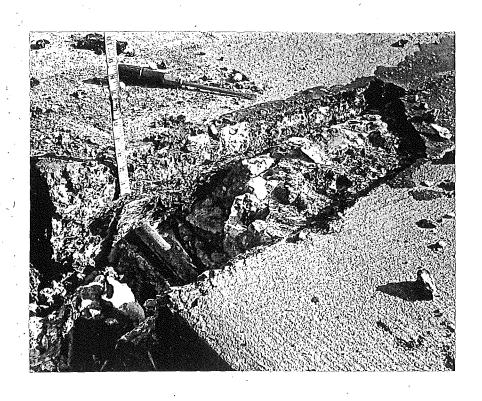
Position of Expansion Joint Filler at Sta. 48 + 10.
